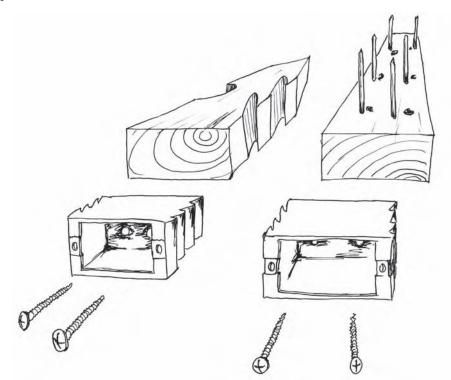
Barbed wooden peg to be hammered into the bale wall onto which the electric wall box is secured
